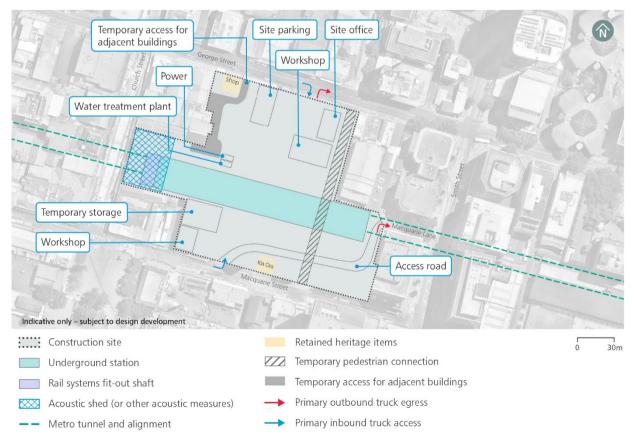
Revised indicative construction site layout - Parramatta metro station
